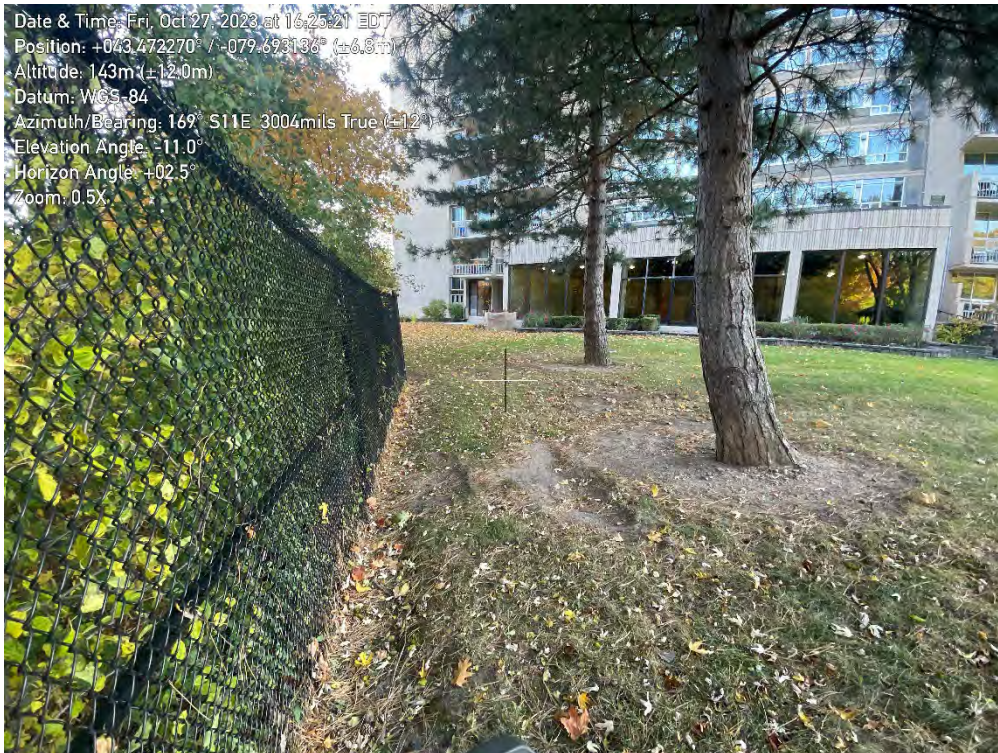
View of slope crest in Zone A8 at 1359 White Oaks Boulevard, looking Southeast.
